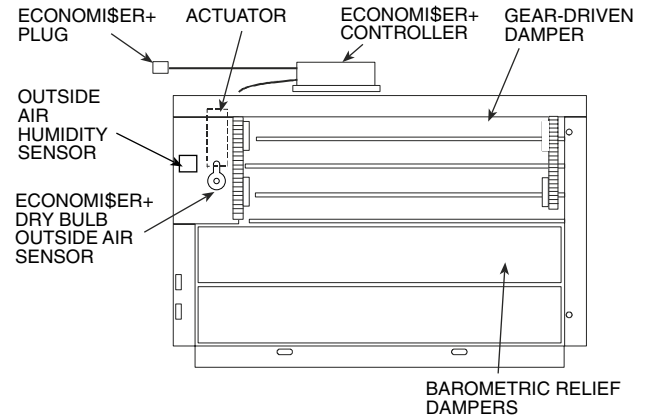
EconoMiSer+ Component Locations — 7½ to 12½ Ton Units
